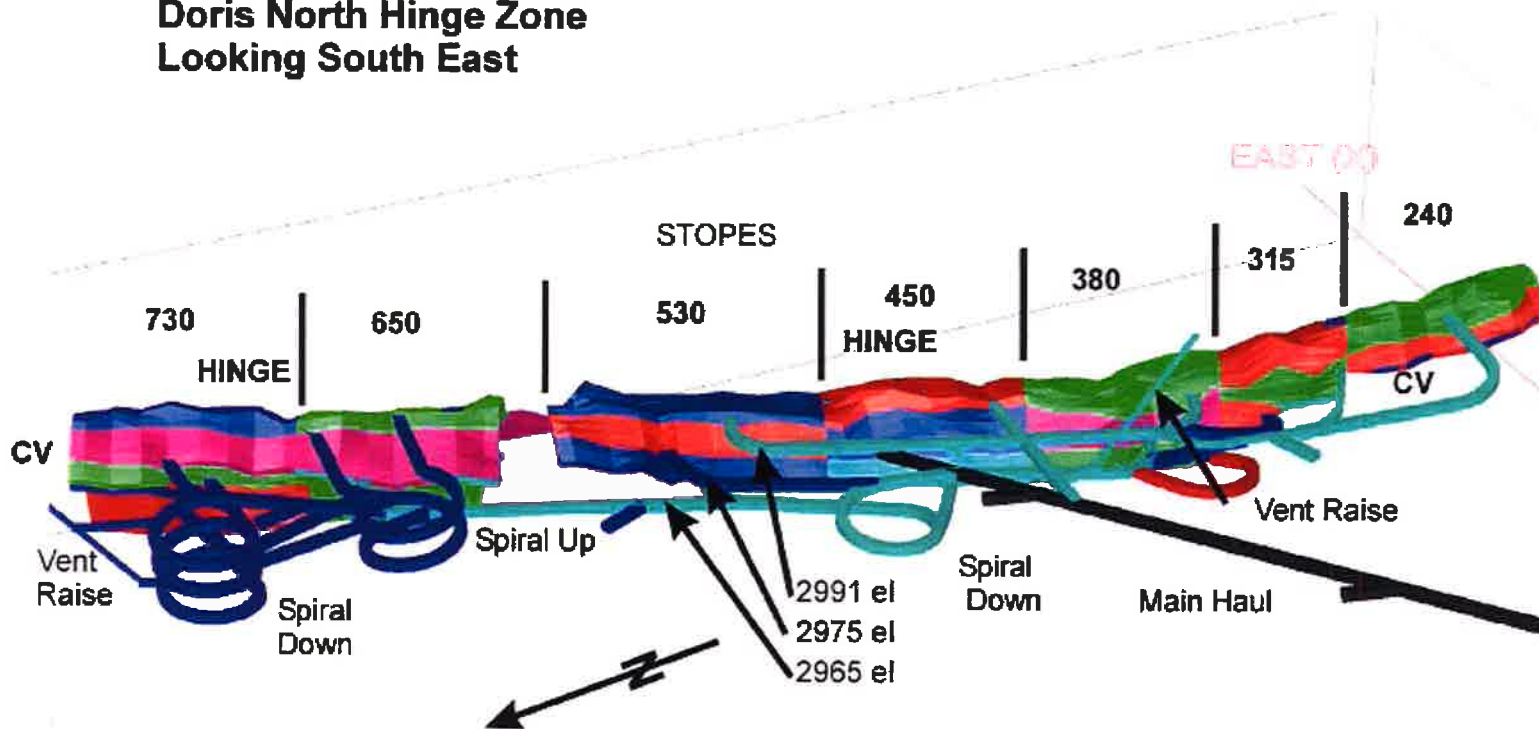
Doris North Hinge Zone Mine Design Looking Southeast
